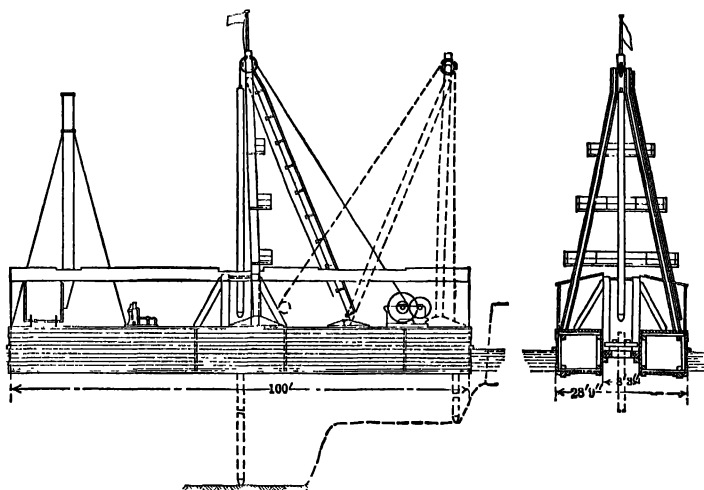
A.—Side elevation and cross-section of Lobnitz rock cutter.
